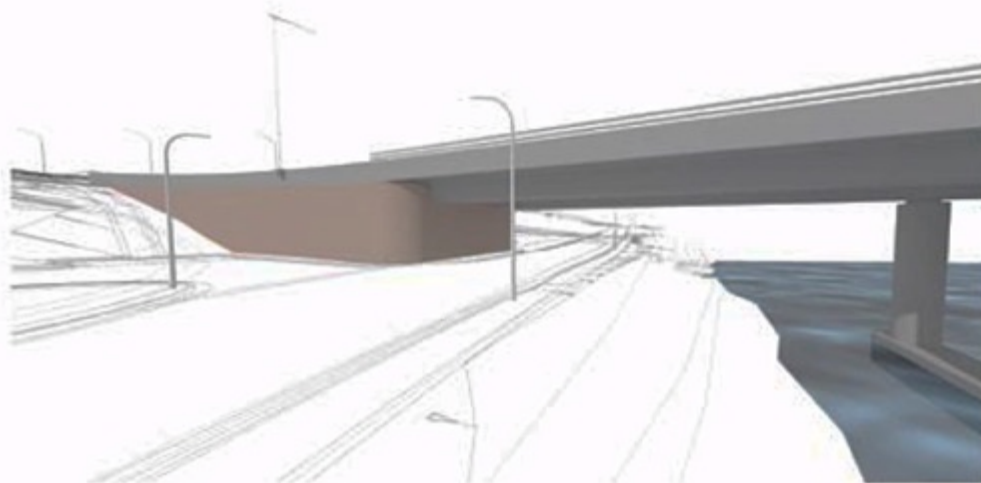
View from The Terrace with the longitudinal drainage pipe behind the downstream parapet and the two water mains and recycled water main located between the girders.
